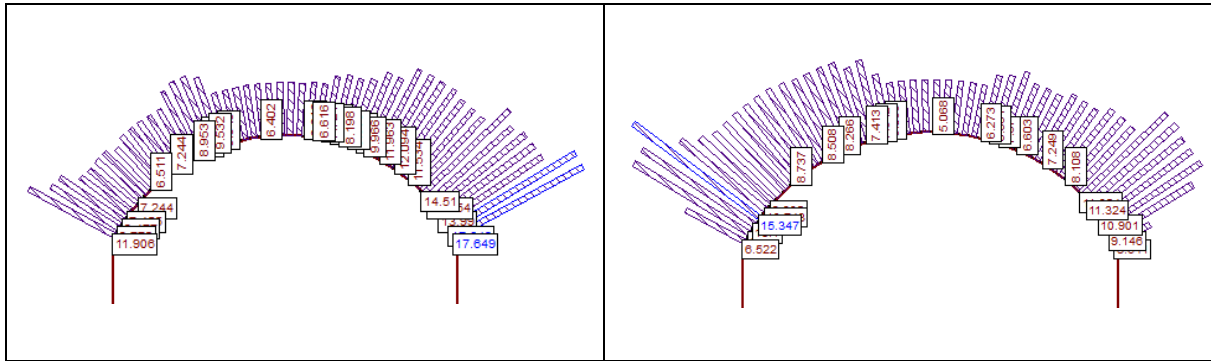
Minimum factor of safety in Original Alignment N55°E (Left) & Alternative Alignment N20°E (Right) after providing shotcrete support
